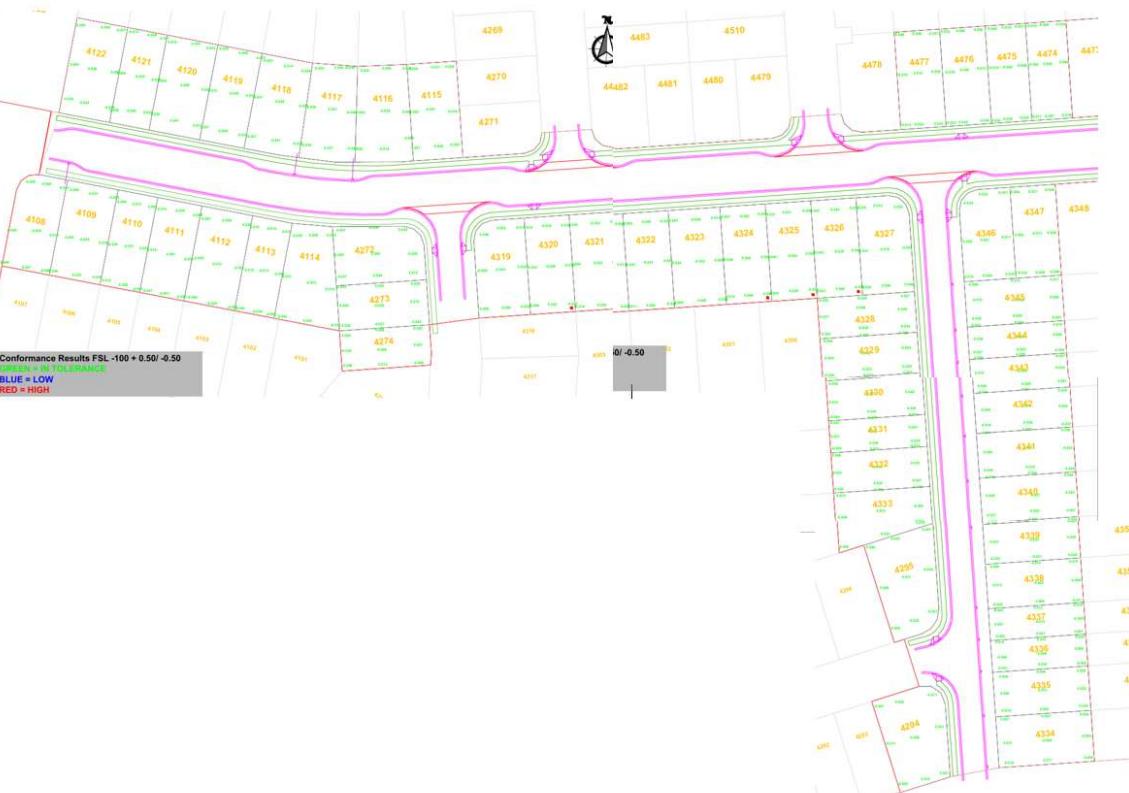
Actual Constructed Area of Fill (100mm BFSL) – Shadforth Survey Plans
